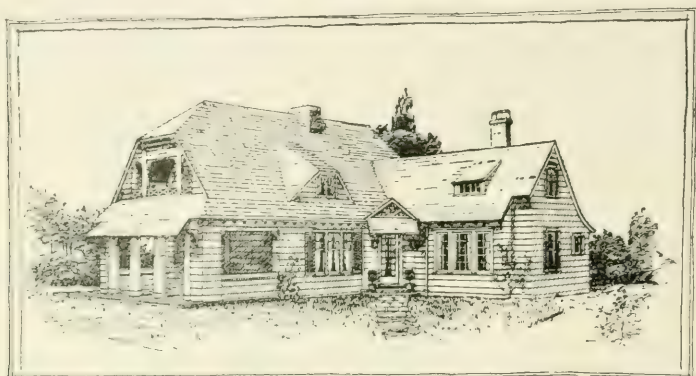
A farmhouse plan, showing diagonal corners used deliberately for purpose of design
